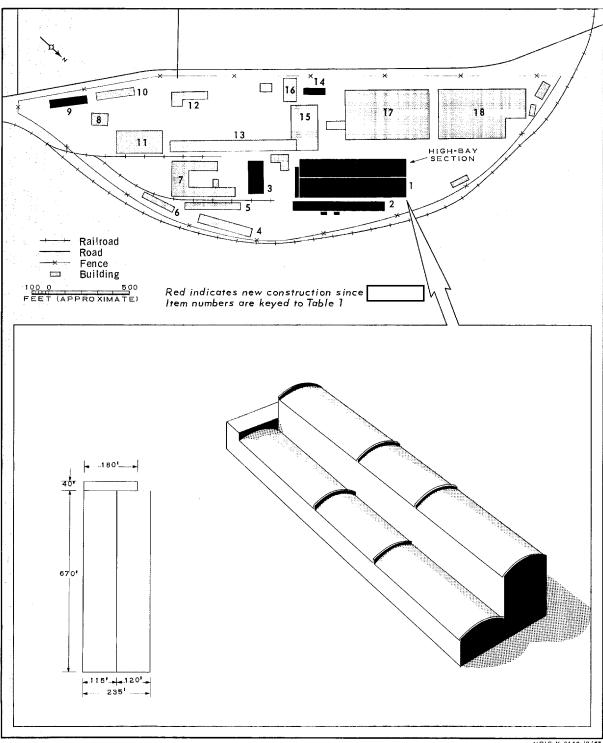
LAYOUT OF KIROV INSTRUMENT AND ELECTRIC MOTOR PLANT NO 266 AND PERSPECTIVE AND PLAN VIEWS OF BUILDING 1.
